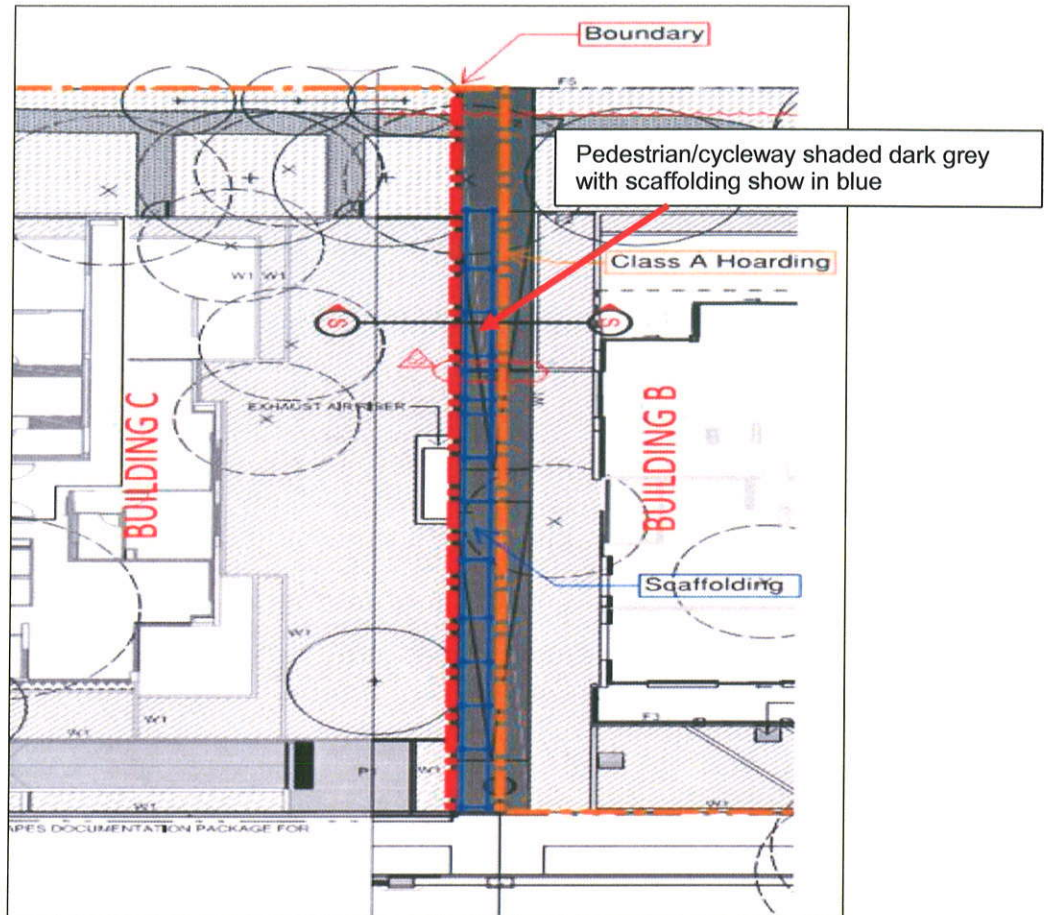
Plan view showing location of pedestrian/cycleway and scaffolding required to construct building C
